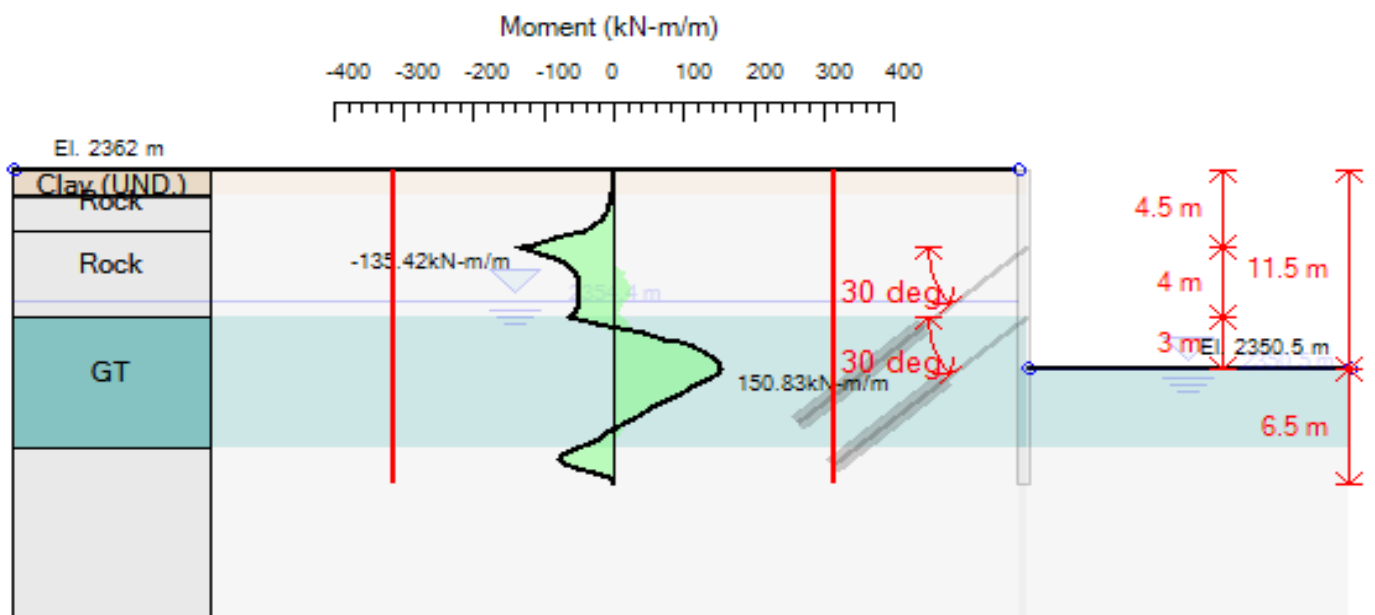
wall bending moment and moment capacity for 0.6 m and 4.5 m first anchor level
